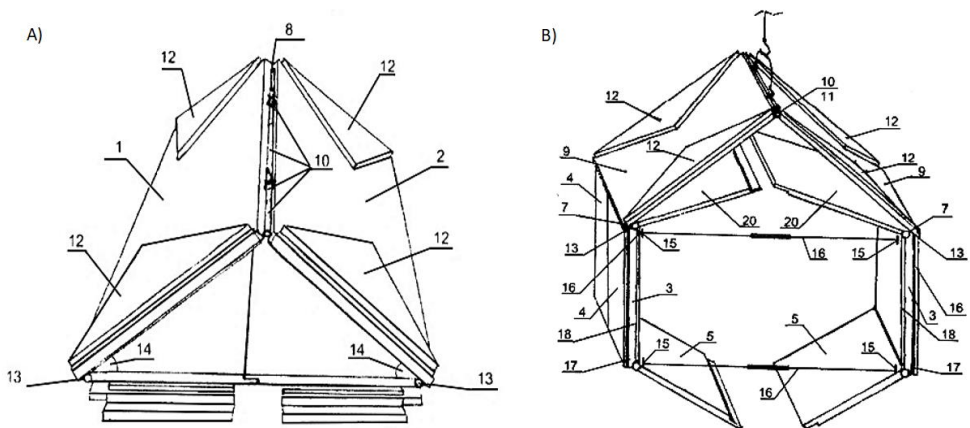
The transformation process of a fast-erecting low-rise building. A) Folded building. B) The building during the installation process.
